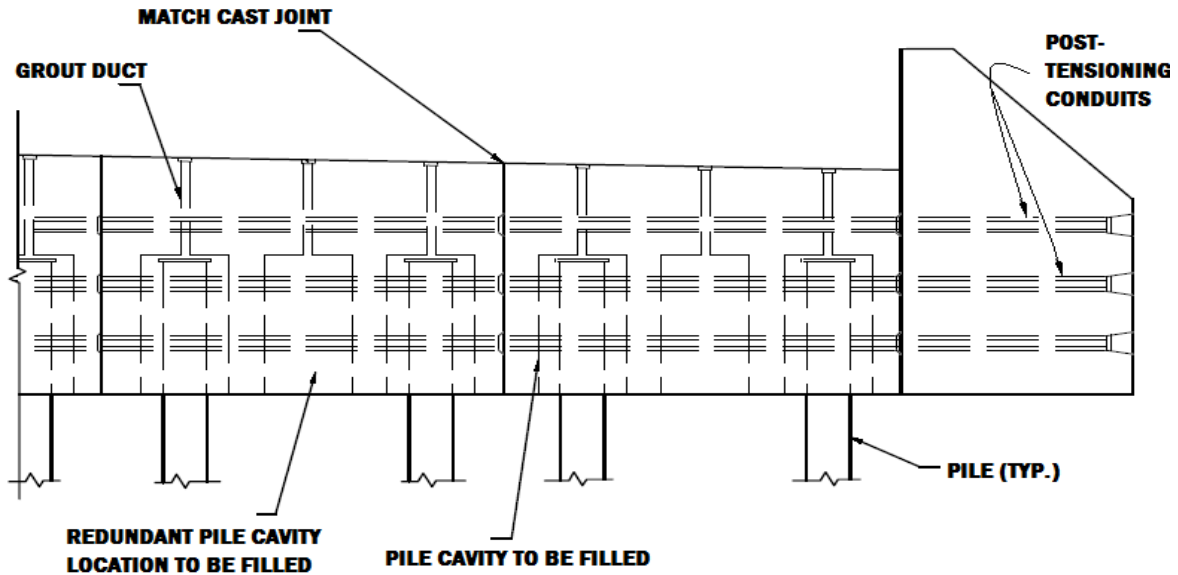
Segmental abutment with redundant pile cavities (Source: Culmo 2009)
